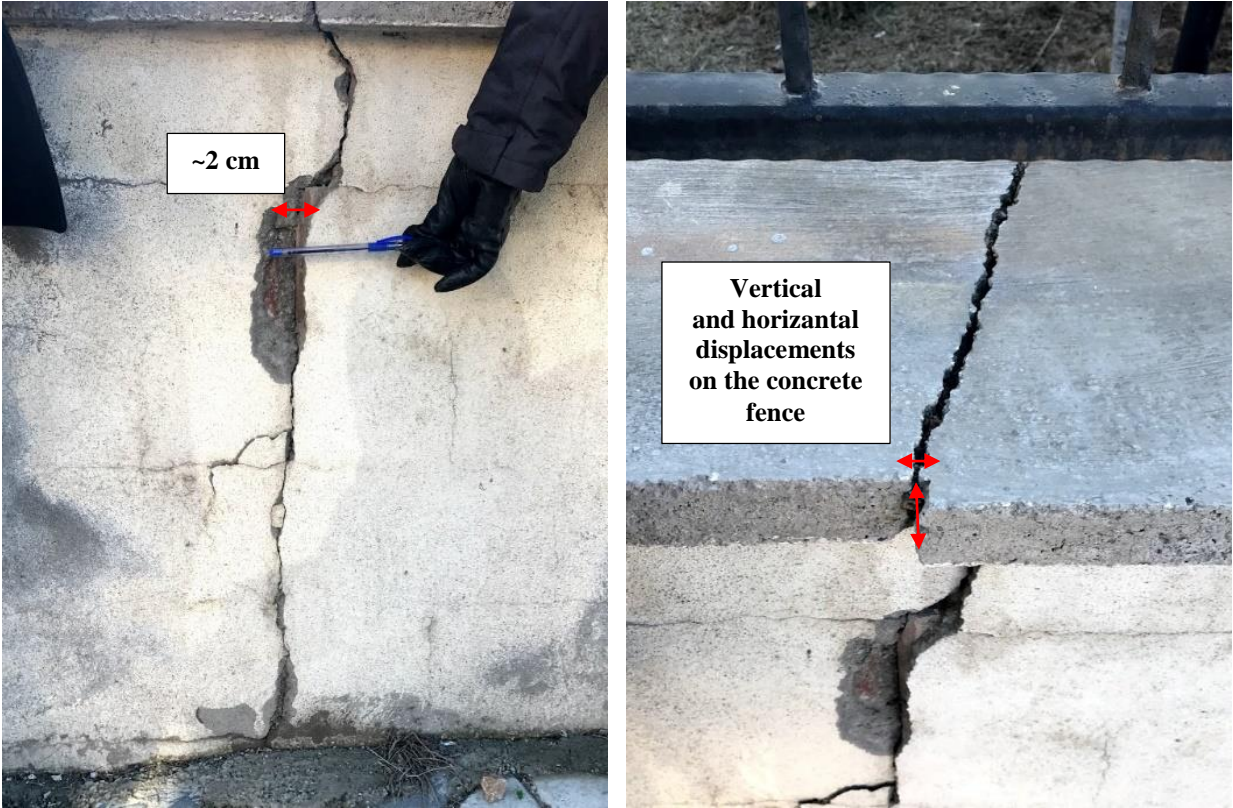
A crack on a concrete fence in Sürsürü district of Elazığ city center
